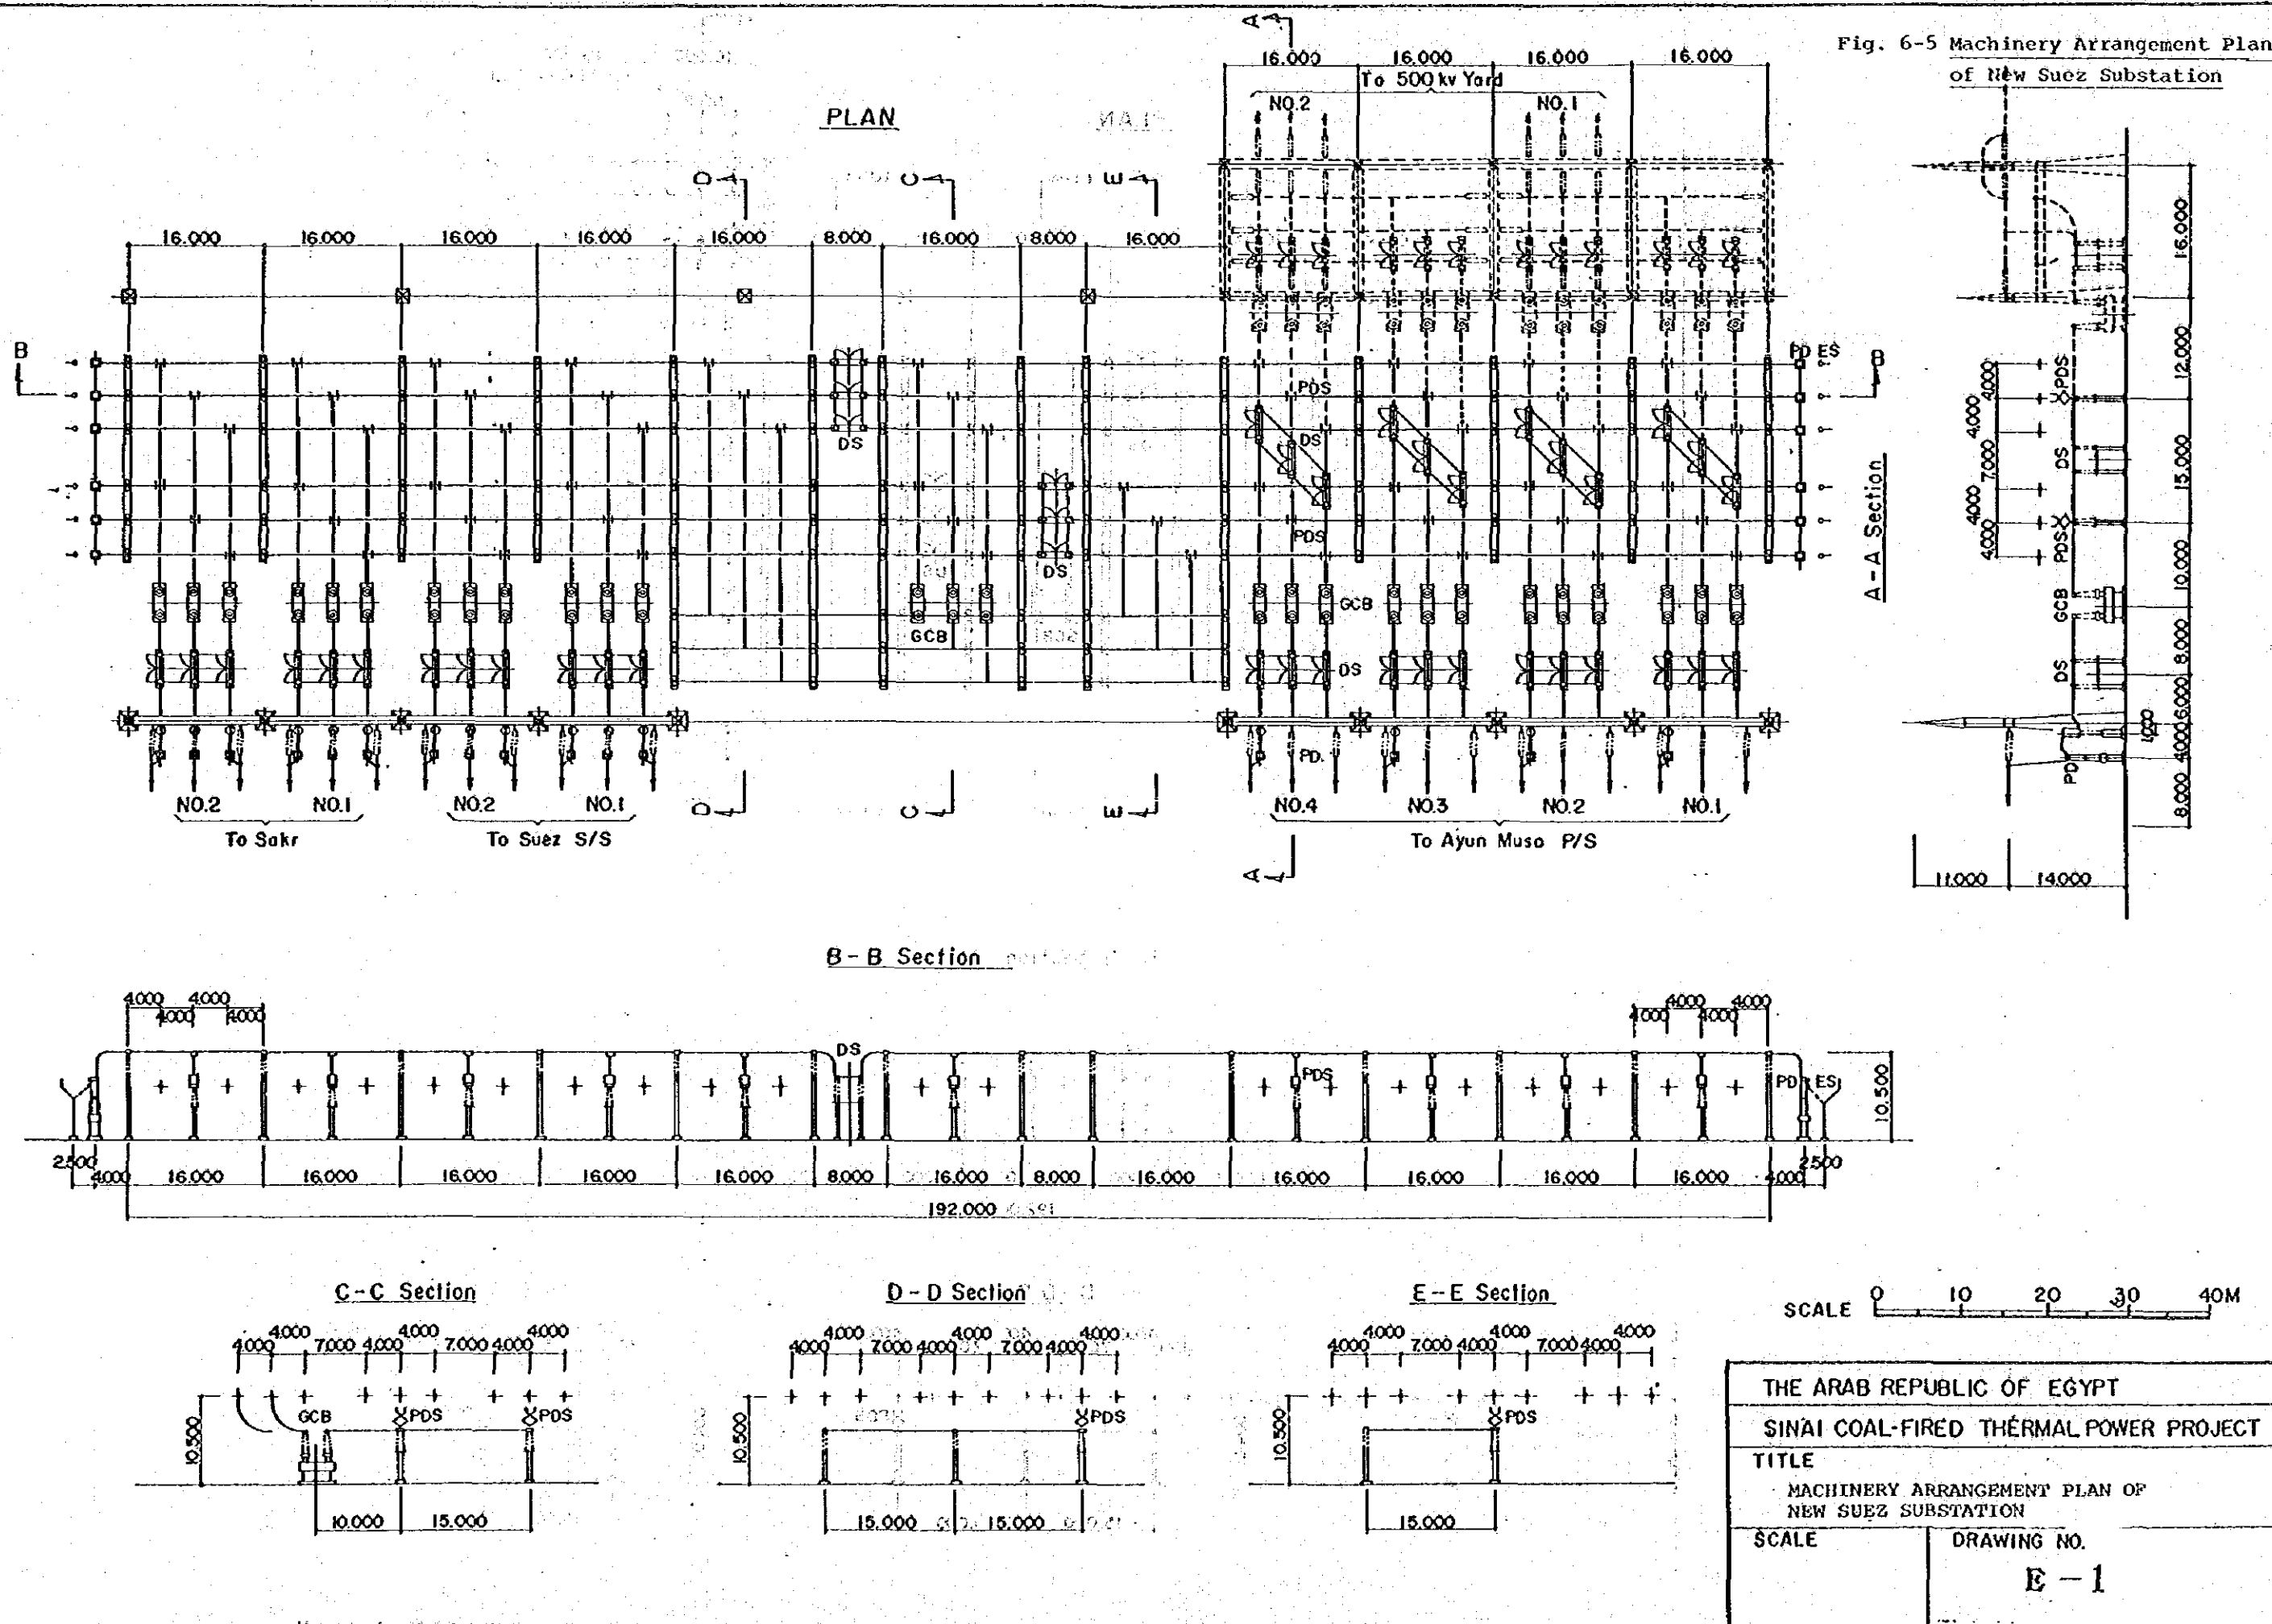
Machinery Arrangement Plan of New Suez Substation
